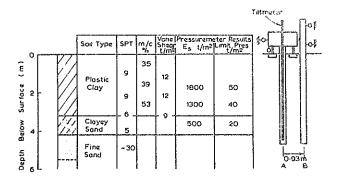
Soil profile and test pile arrangement (Frydman et al, 1975)
